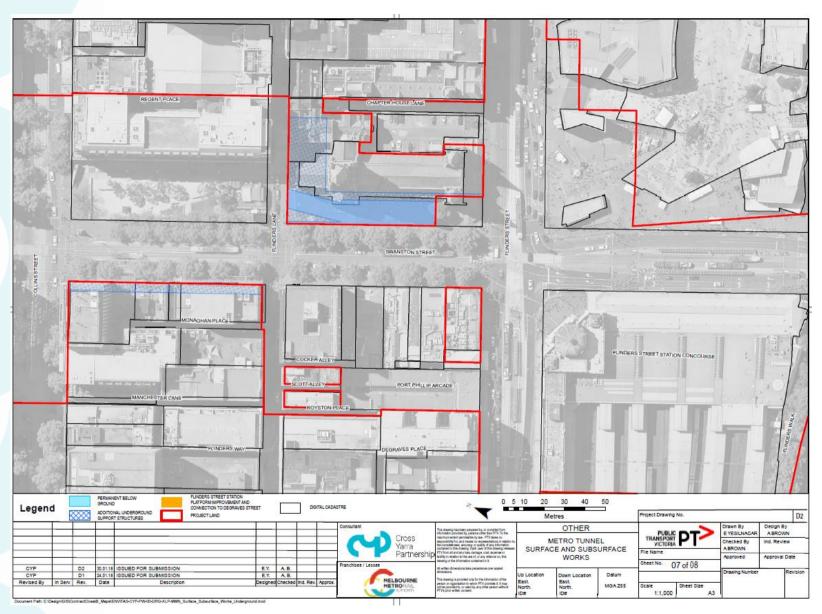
ADDITIONAL PROJECT LAND REQUIRED FOR PERMANENT BELOWGROUND AND UNDERGROUND SUPPORT STRUCTURES AT CBD SOUTH STATION
